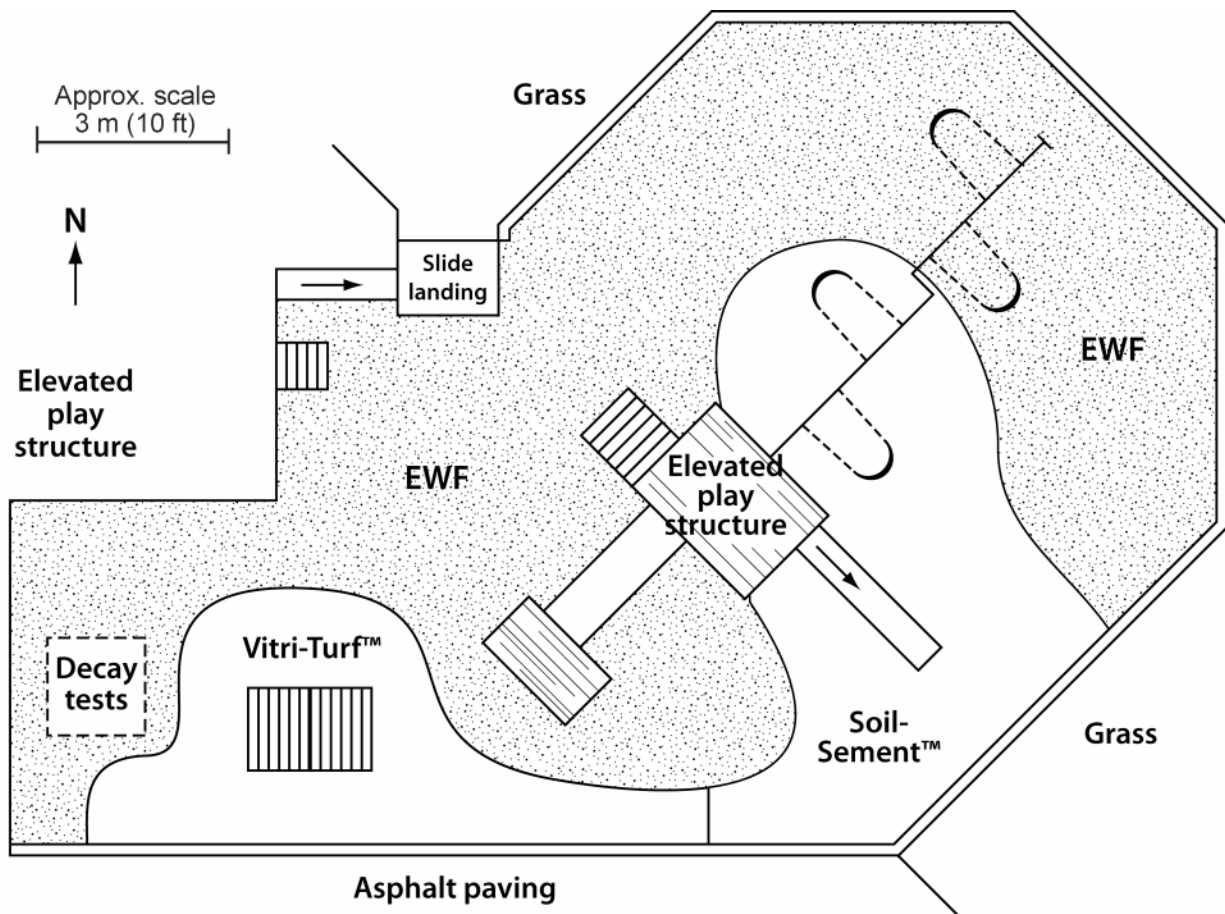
Schematic plan of playground site at Governor Nelson State Park.
